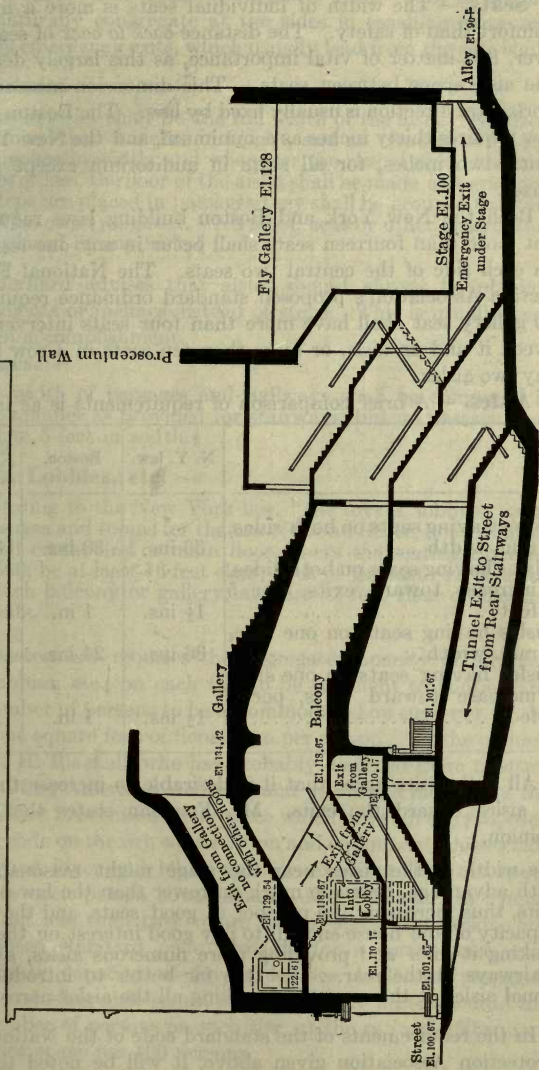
Section through Tunnel and Emergency Exit, Model Theatre Design.
